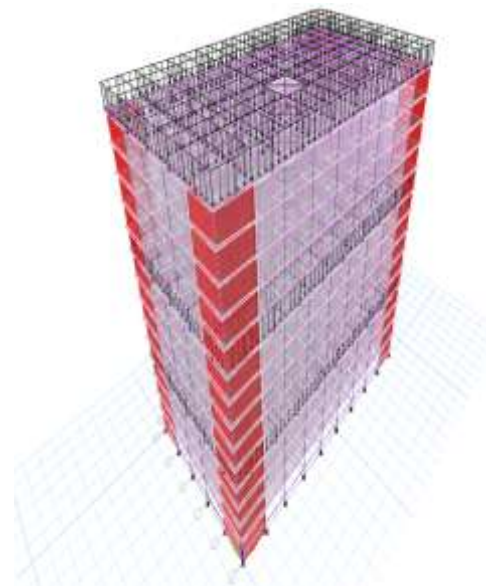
Irregular flat slab building with 200% mass irregularity at the 5th, 10th & 15th floor and shear wall at core
